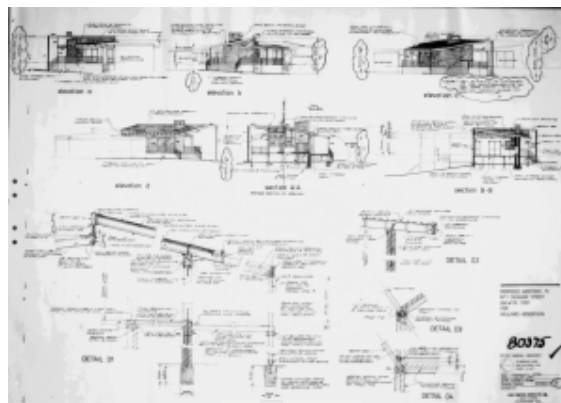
Elevations of the proposed family room designed by architect Peter Sandow in 1986. (Source: BP 80378)
